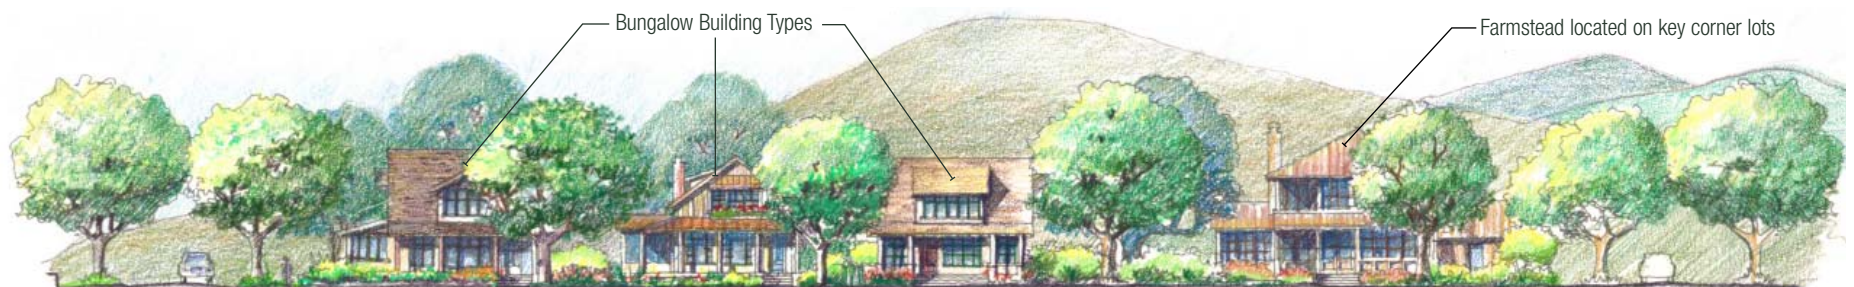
Conceptual Street Elevation - Bungalow and Farmstead Building Types
